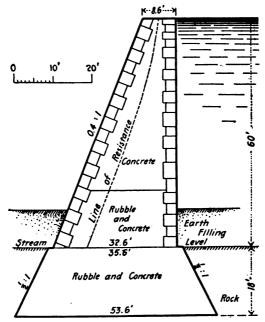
Section of Boyds Corners dam, New York; built 1867 to 1870; rubble masonry; length 670 ft.; max. height 78 ft.; contains 27,000 cu. yd.
